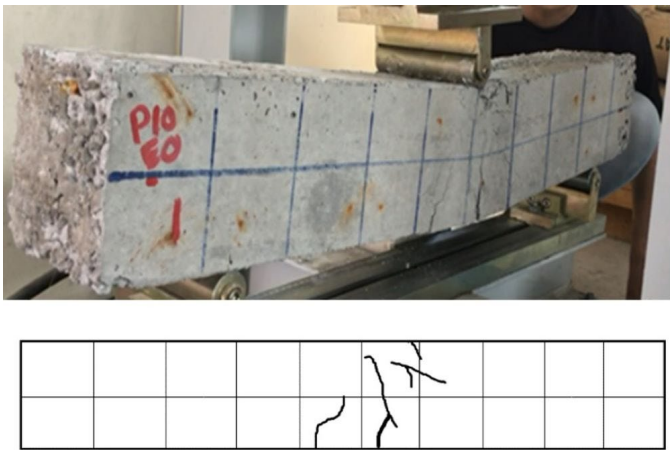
Reinforced concrete beam's crack pattern with 10% POFA
